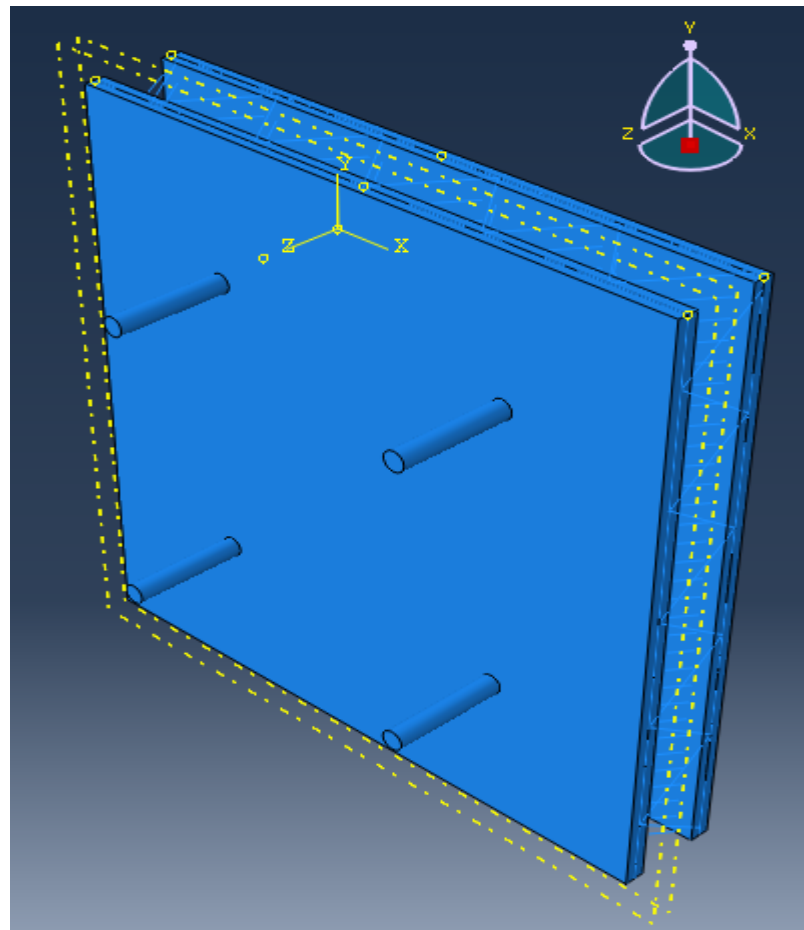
3D Panel with 6 Inch Space between the Concrete Layers
